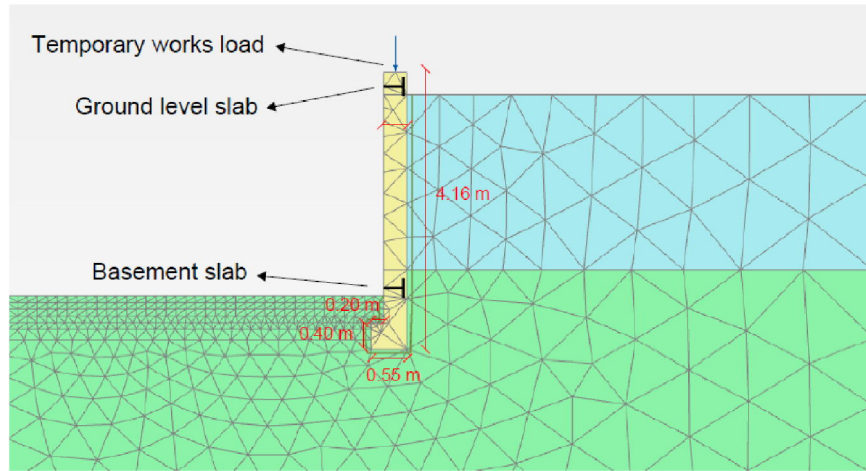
Sketch of 2D model used for the basement wall stability assessment.
